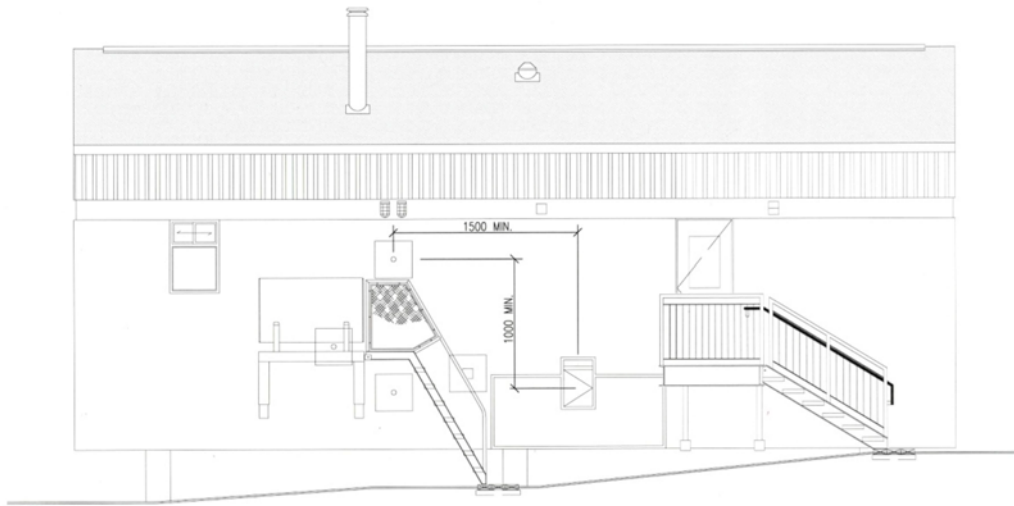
DRINKING WATER FILL PIPE CONNECTION / SOURCE: SHQ
